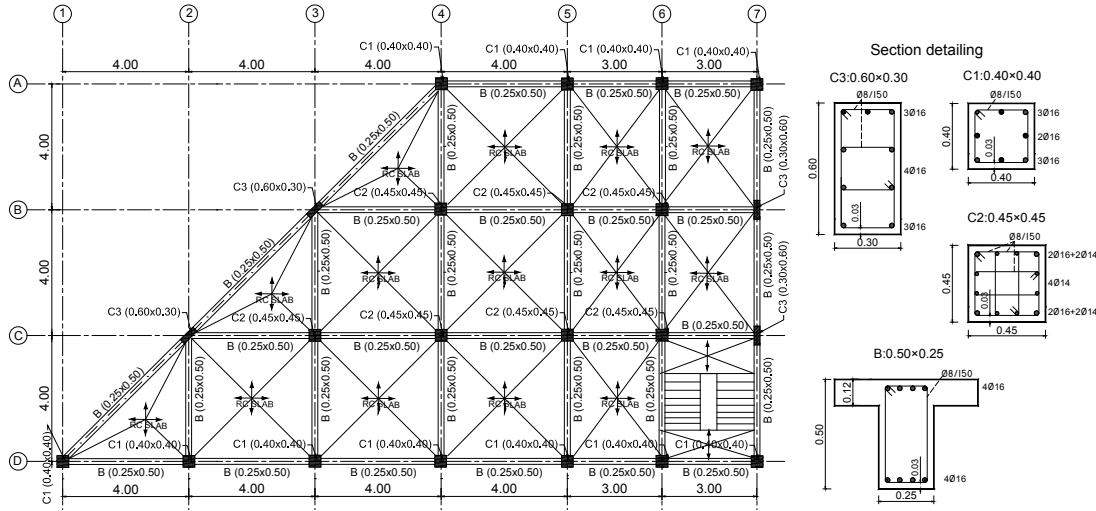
Plan view of a typical storey of the 3-Ir, 4-Ir and 5-Ir buildings and the design details (all dimensions are in m).
